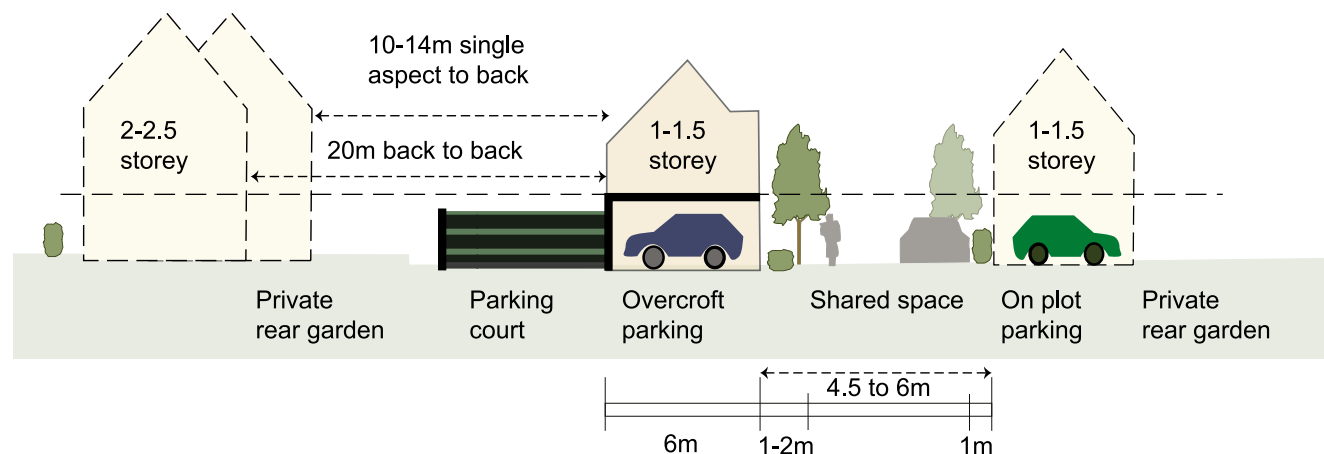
Mews section and plan illustrating variety of parking and intimate street within the perimeter block
